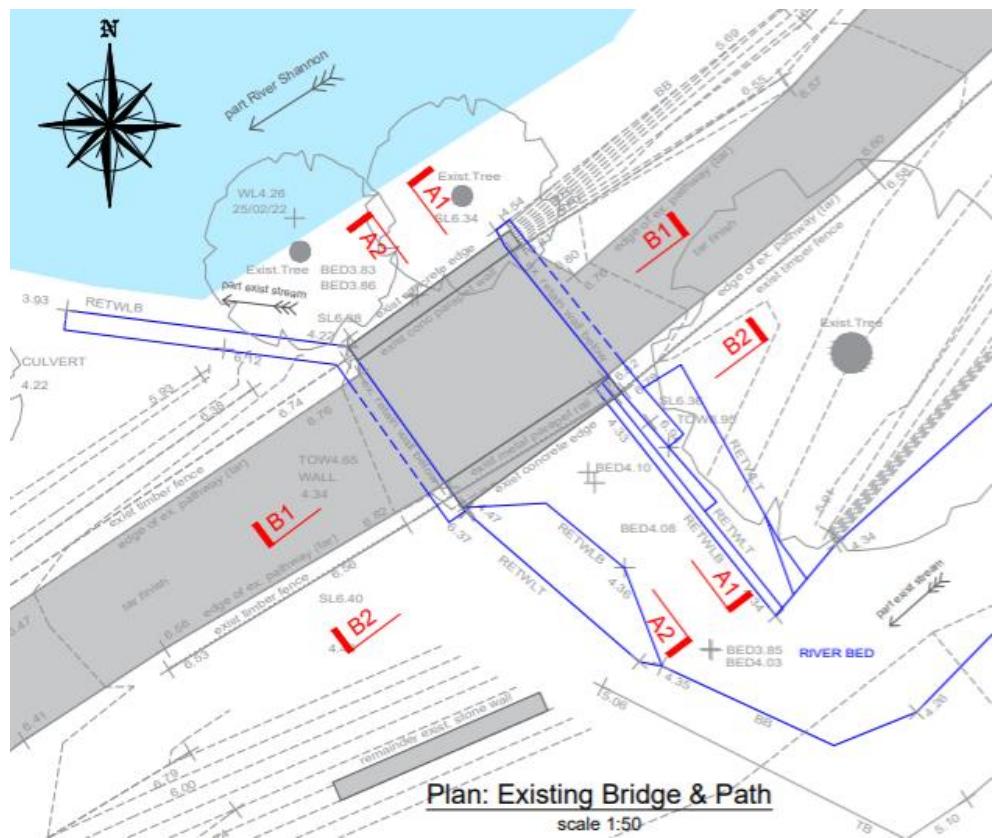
Plan of existing Bridge 1 (refer to drawing RHA-XX-DR-S-SP0010)
